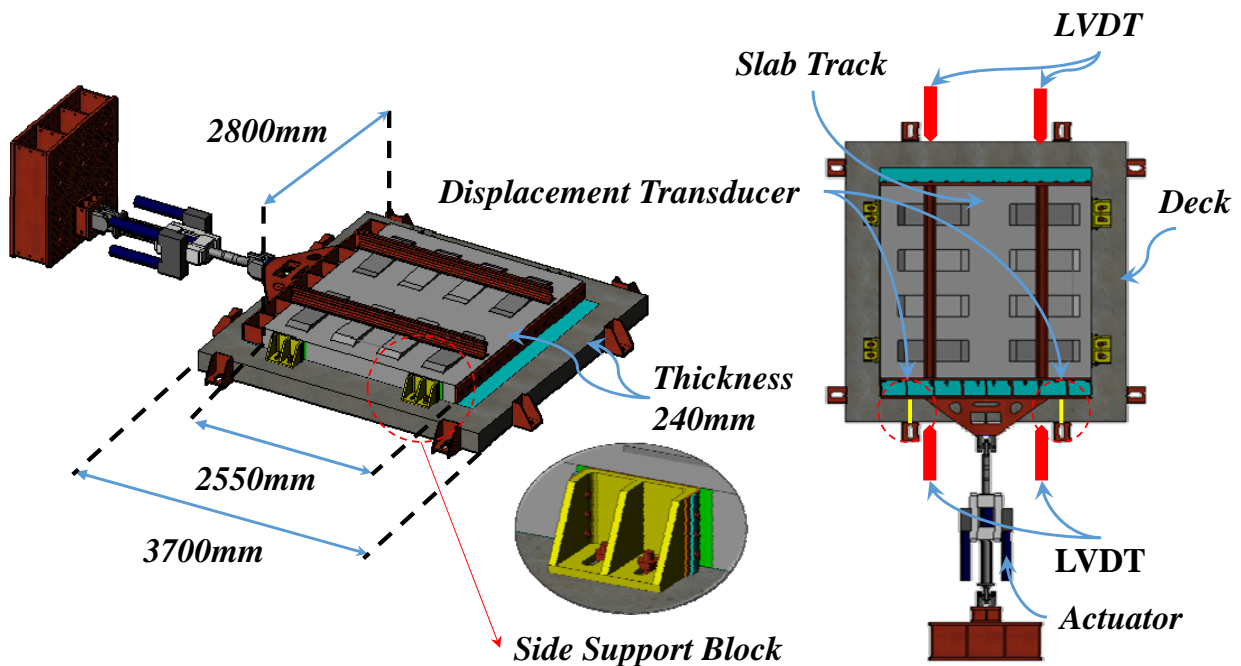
Detail of The Sliding Concrete Track Specimen & Measurement plan
